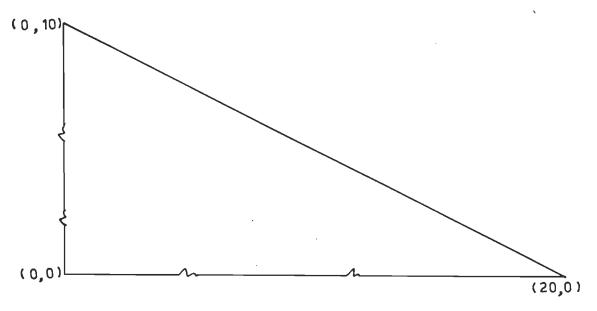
Cross Section of Natural Slope (Example1)
